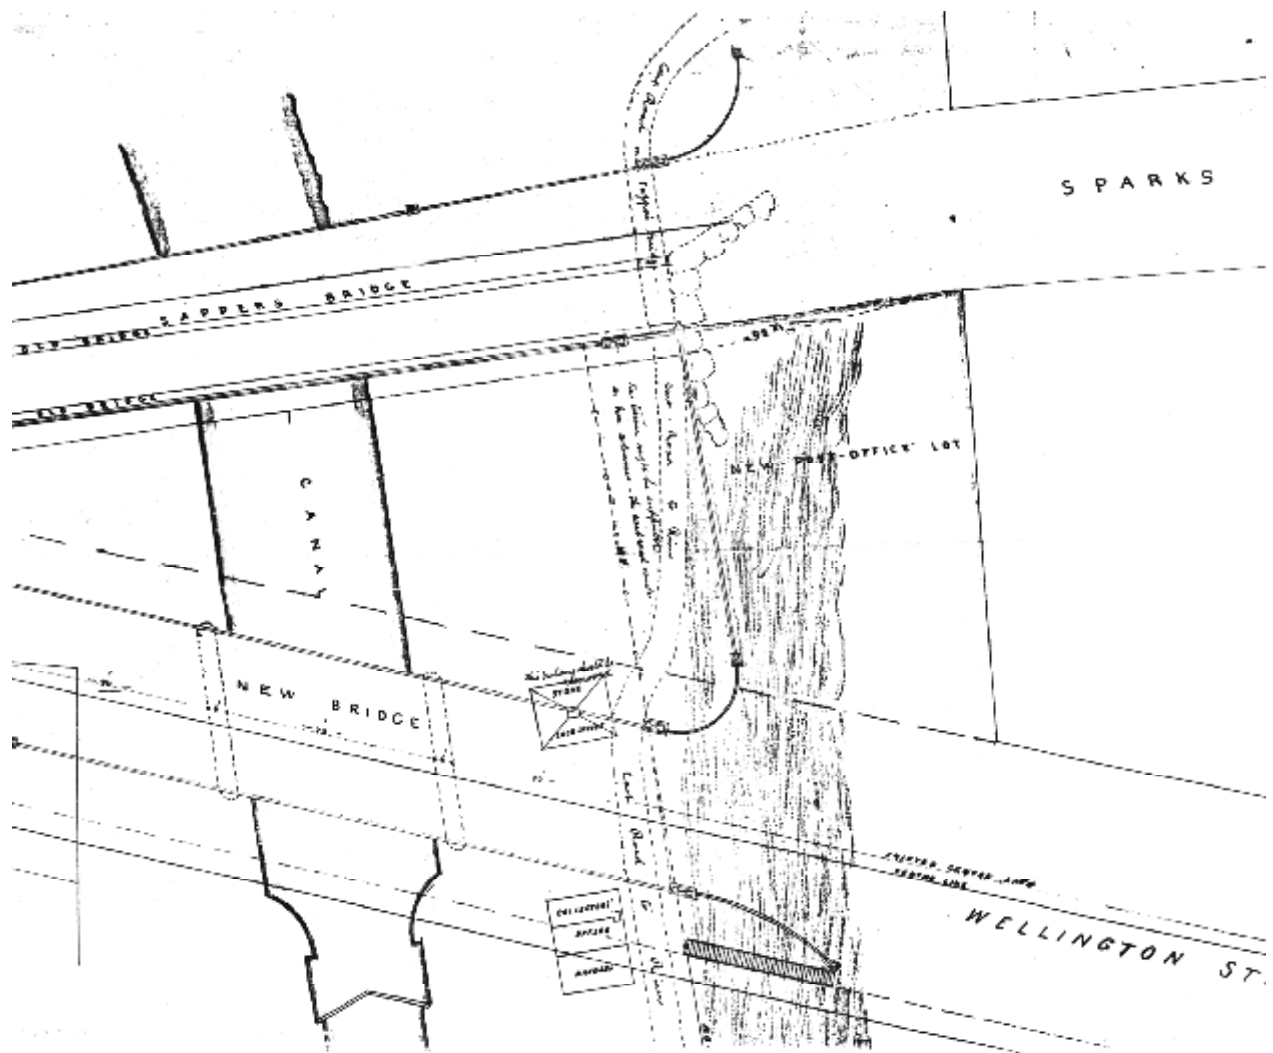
Detail from “Site Plan” Sapper-Dufferin Bridges, Plans [1885]. This is probably an earlier map as the Dufferin Bridge was built in 1872. The blacksmith shop, now called “Stone Lock Office” is labelled “this building should be removed”. The road to the locks was located to the west of the smithy until ca. 1872. (Public Archives of Canada; NMC 30575).
